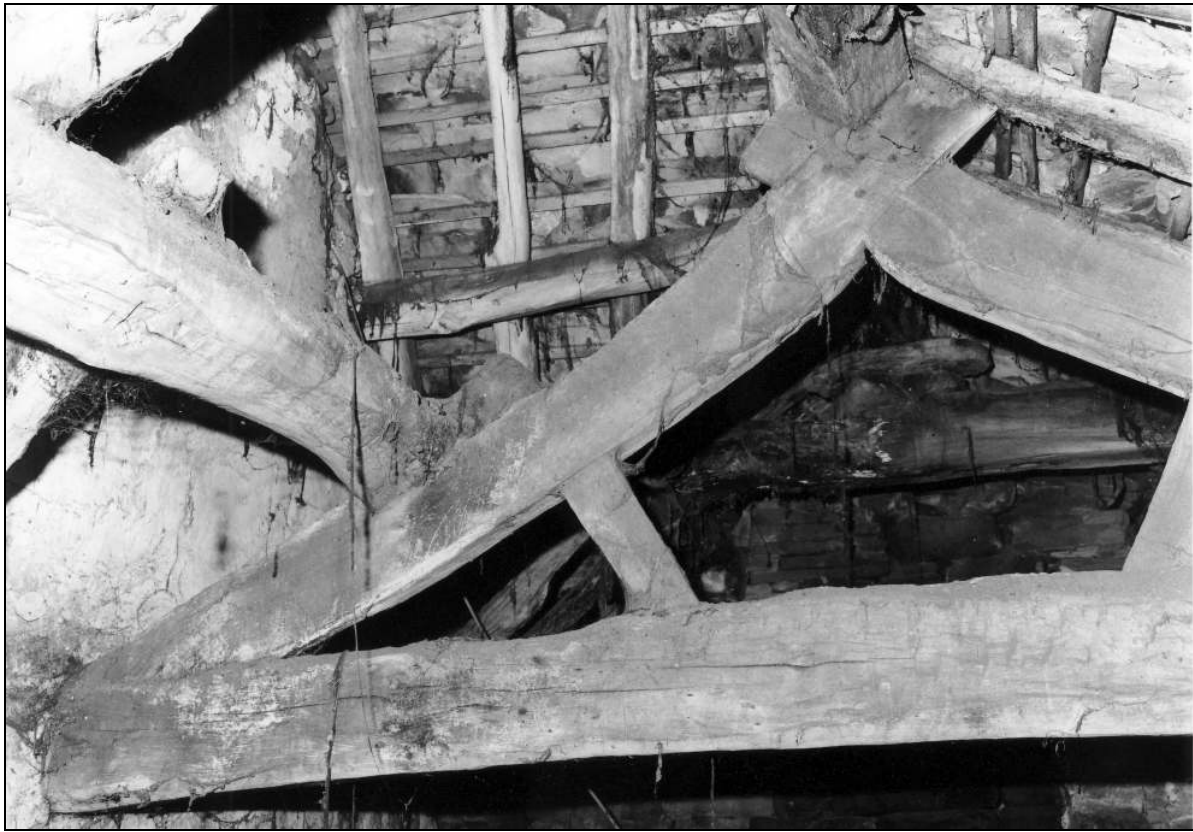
Early wing: detail of roof truss, from the south-east (film 3, frame 16)
